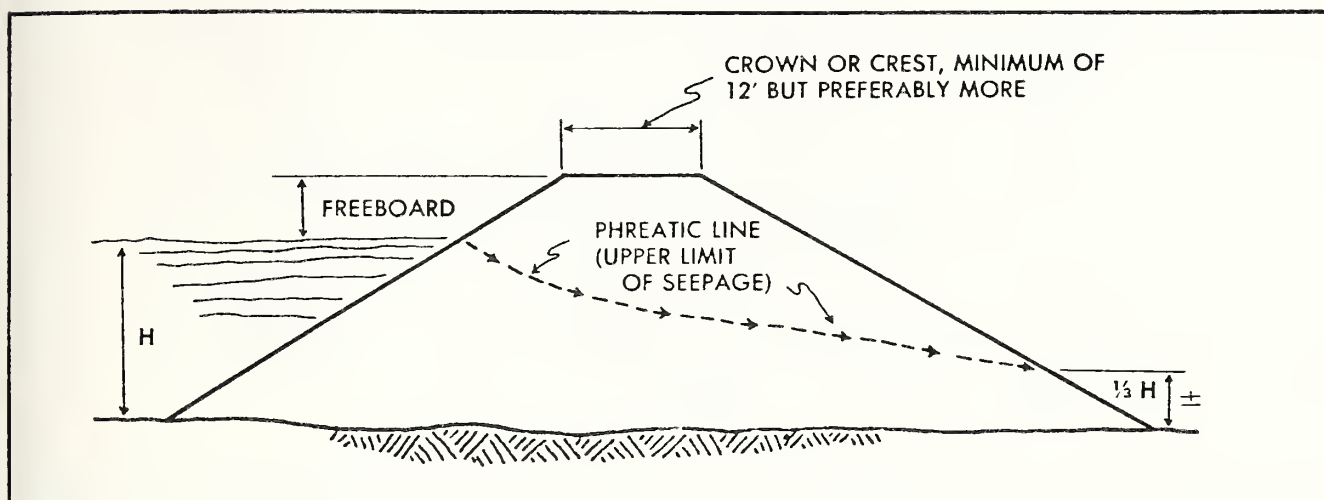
Plans for constructing a typical homogenous fill dike.
